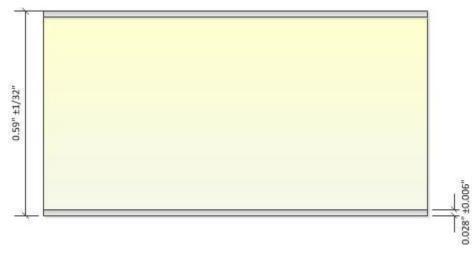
5/8-INCH GOBOARD® THICKNESS DIMENSIONS
